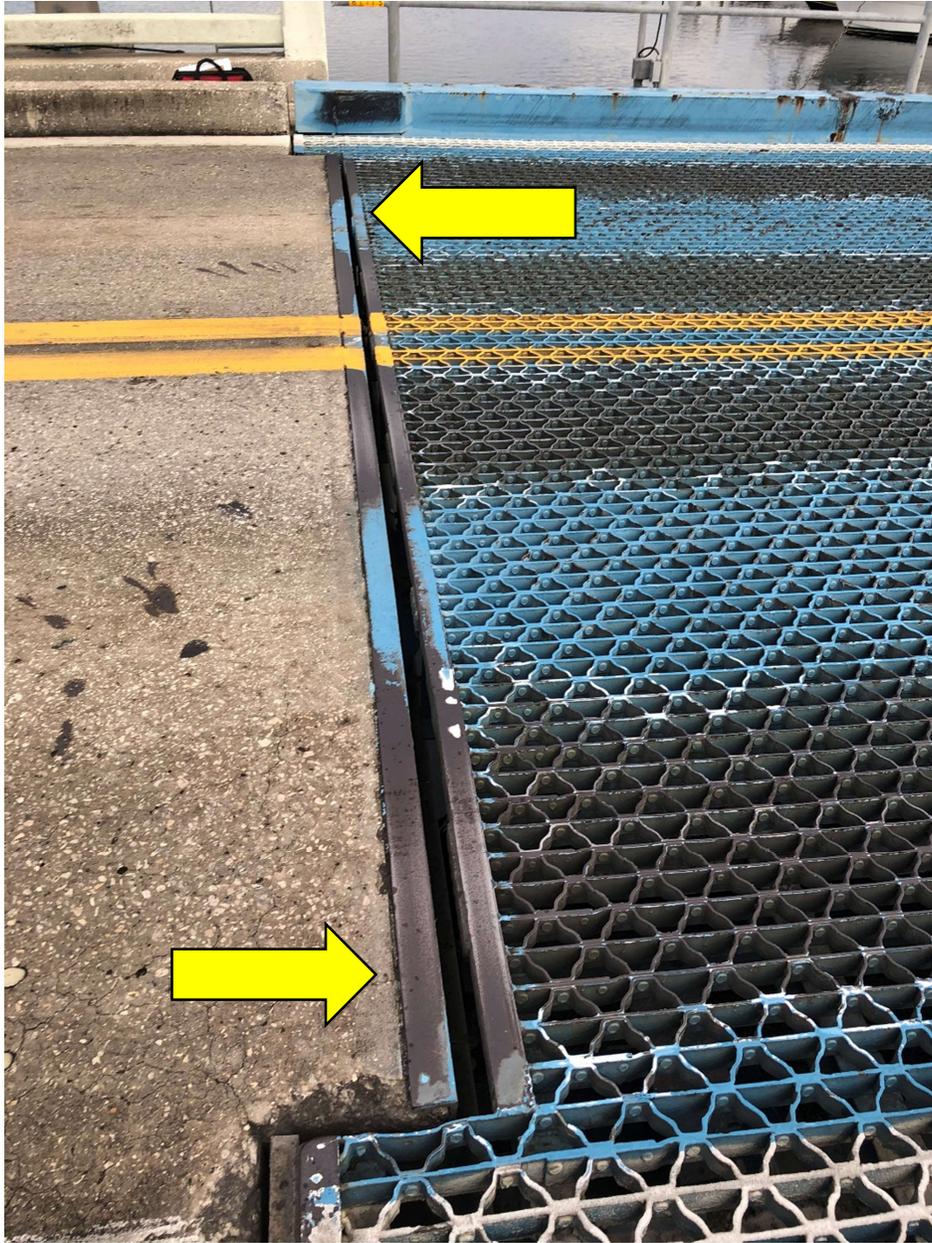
Deck Joint at Bascule Span with Evidence of Horizontal & Longitudinal Movement/Rotation
